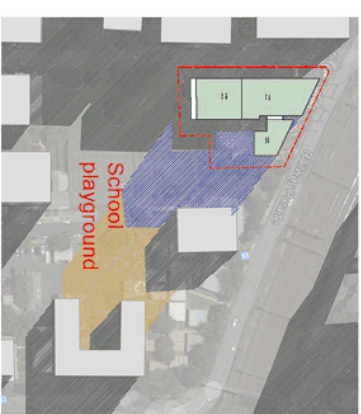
3pm shadows midwinter cast by approved and proposed building forms
